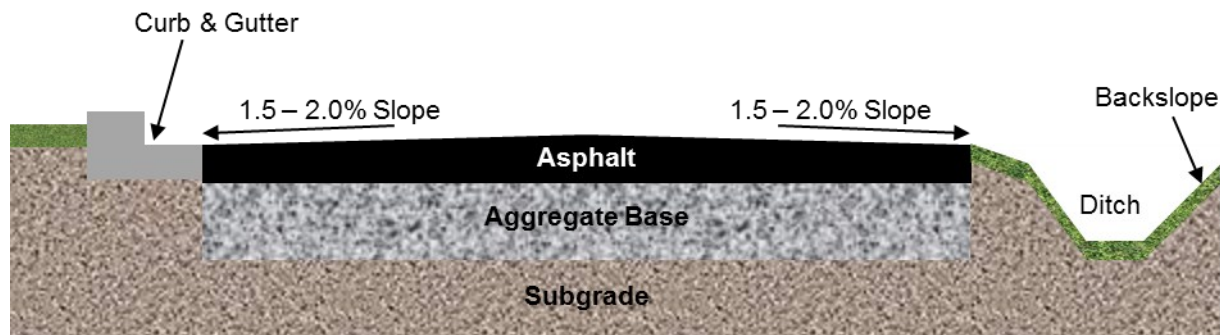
Schematic of surface drainage off of a pavement surface into a roadside drainage ditch or curb and gutter (not to scale).
